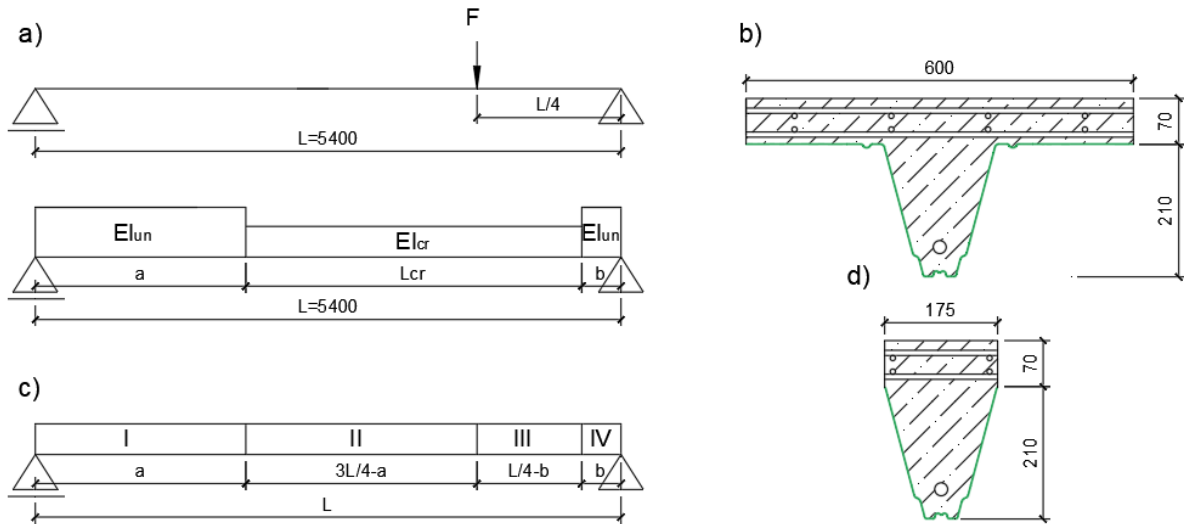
Beam geometry: a) load and bending stiffness; b) beam cross-section with 600mm width; c) beam discrete elements; d) beam cross-section with 175mm width;
